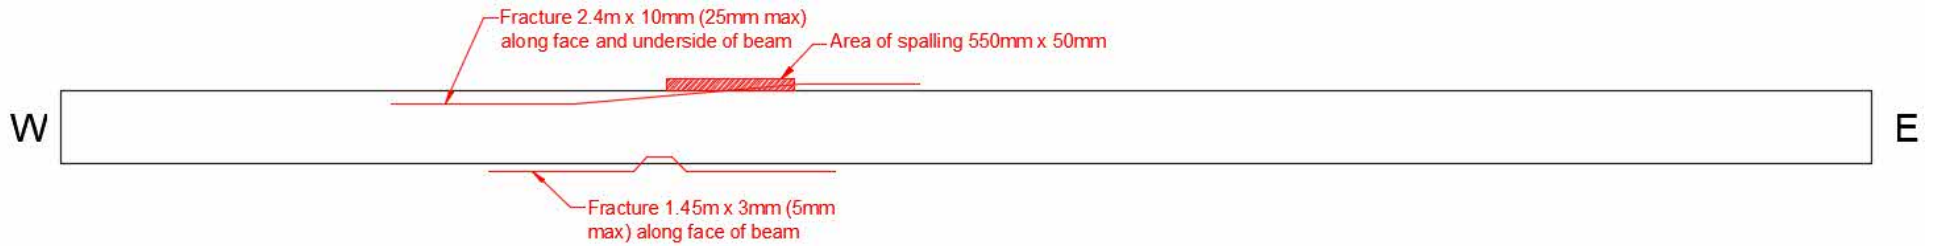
Plan View of Beam No.4 Defects (Photograph 10)
